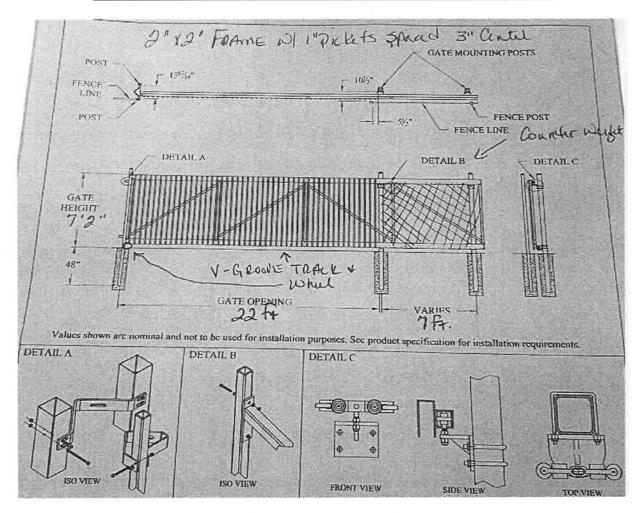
" - Conceptual Wall / Fence Diagrams (East Elevation)
